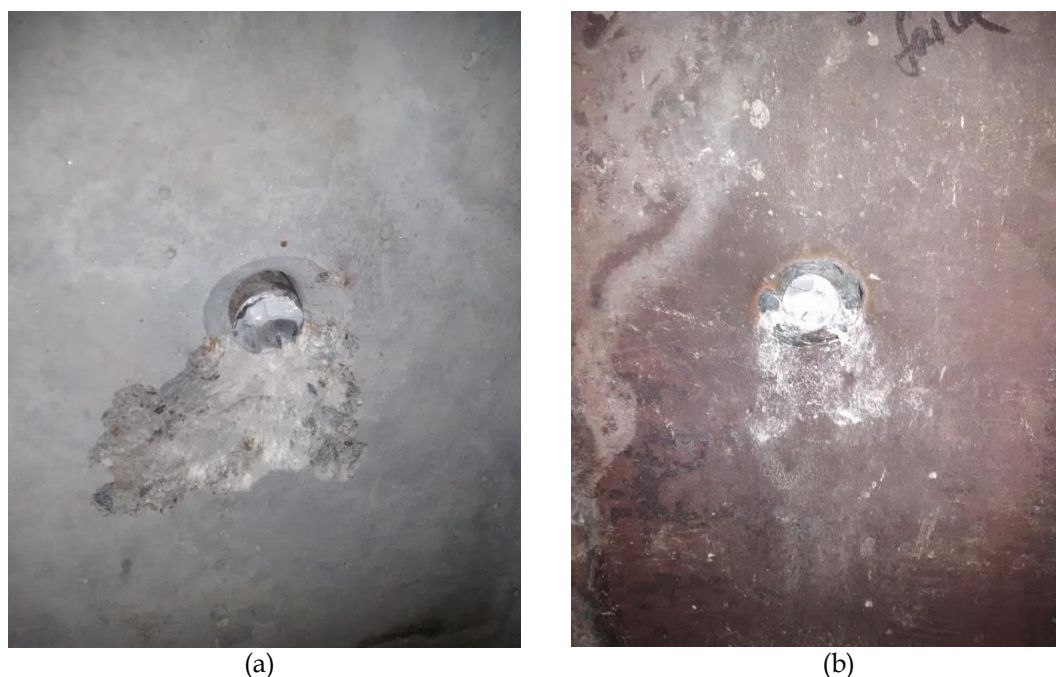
Failure of steel-concrete composite connection having  $C_1$  and  $C_2$  concrete; (a) shank failure at steel surface and (b) concrete crushing on the bearing side
